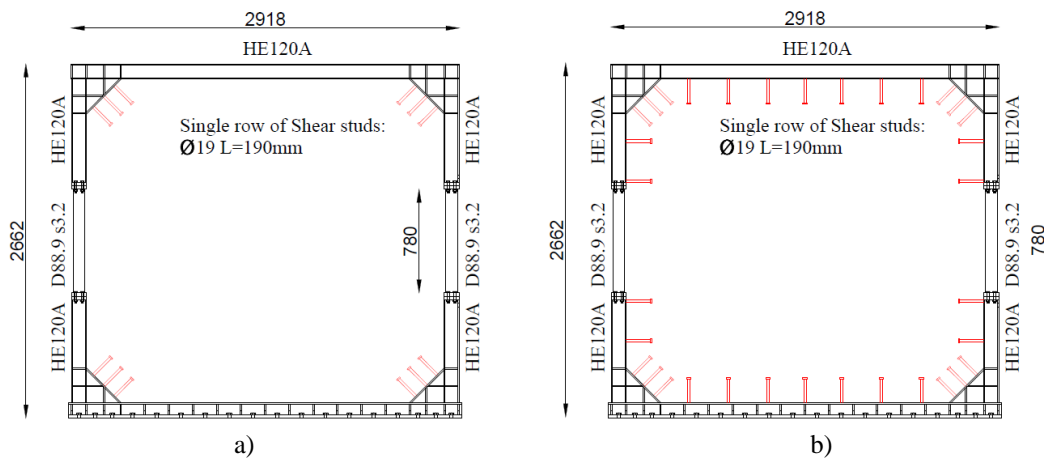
SRCW Steel frame specimens: a) Specimen S1 with shear studs only in the corner; b) Specimen S2 with shear studs all along the perimeter (excluded the dissipative zones).
